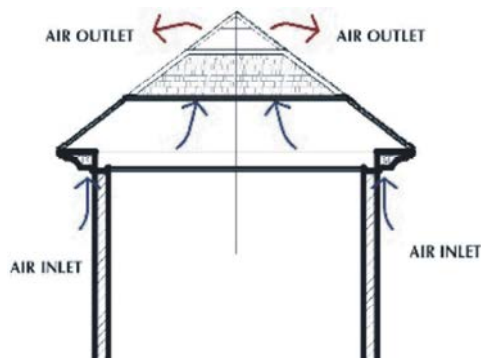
Section through of a concrete facia roof with ducts to let in air and outlet at the rooftop
